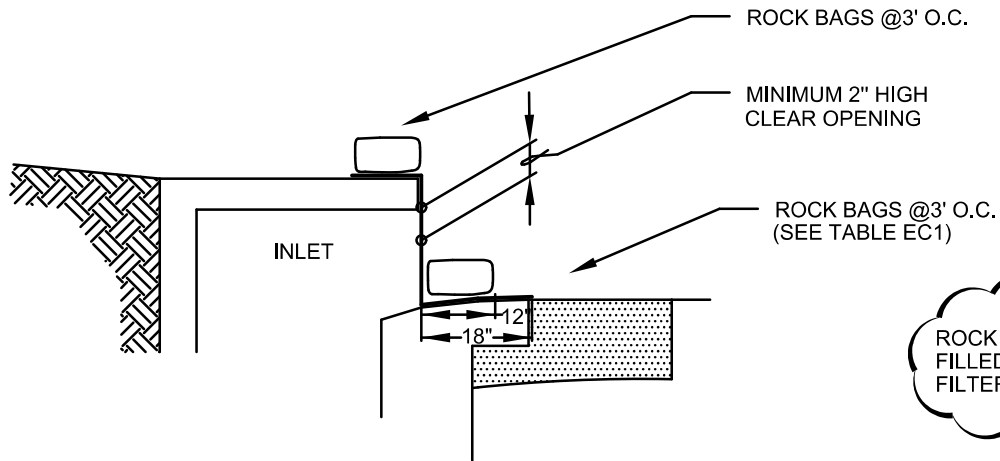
STANDARD CONSTRUCTION DETAIL - FILTER TUBE CURB INLET PROTECTION
